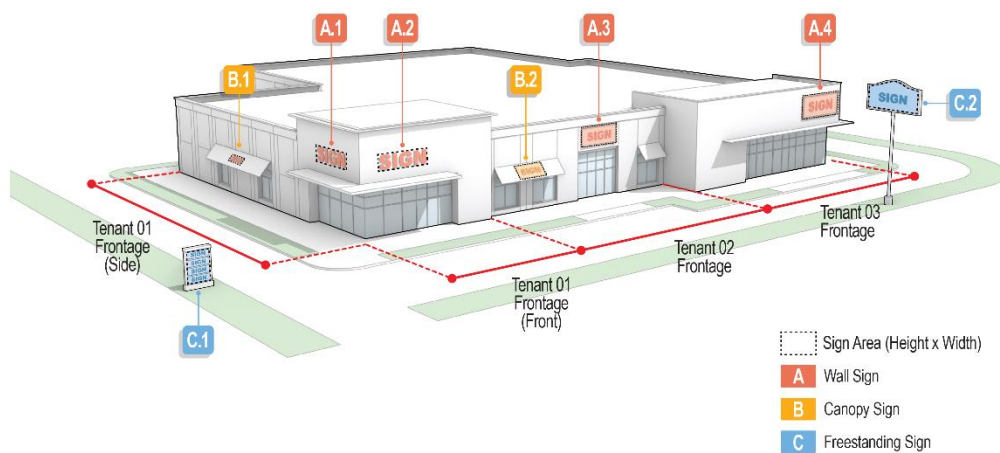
B.3. Comprehensive Sign Plan Elevation Submittal Example
